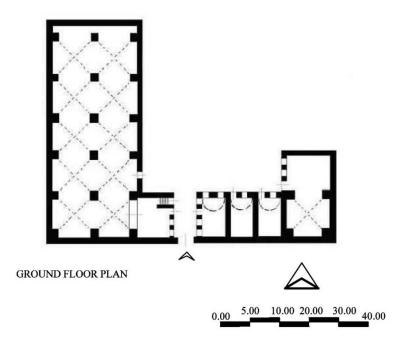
The ground floor plan of Fincancıoğlu Soap Factory, Nizip (Source: Eker, 2006)
